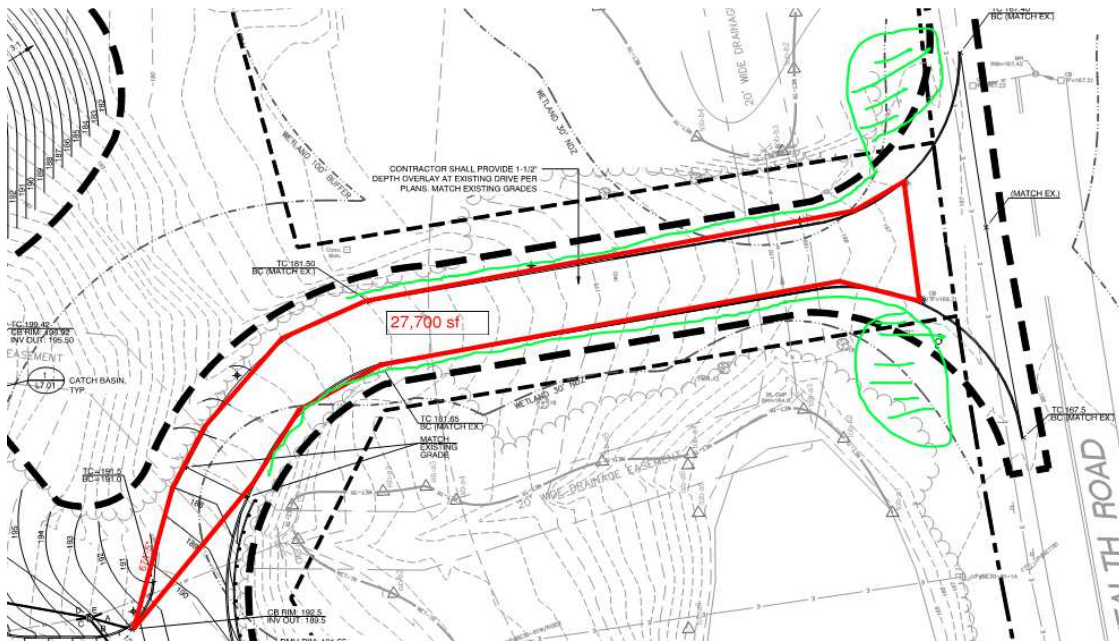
Alternative 2B drainage area (highlighted in red) would flow to a grass swale on each side of the road which would flow to a rain garden for treatment before reaching the existing stormwater collection system.
